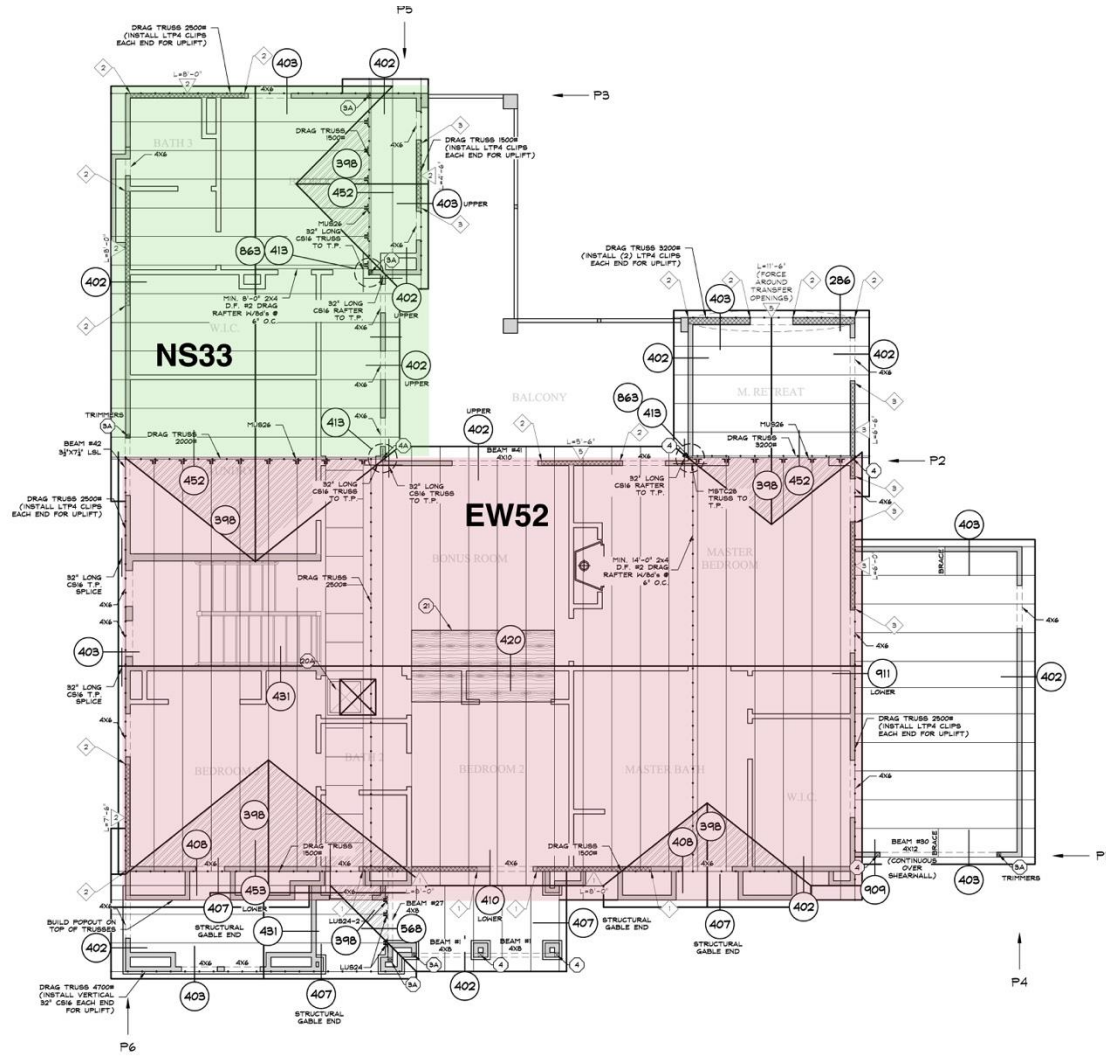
Clovis home roof framing plan. Primary monitoring location was the EW26N volume.
